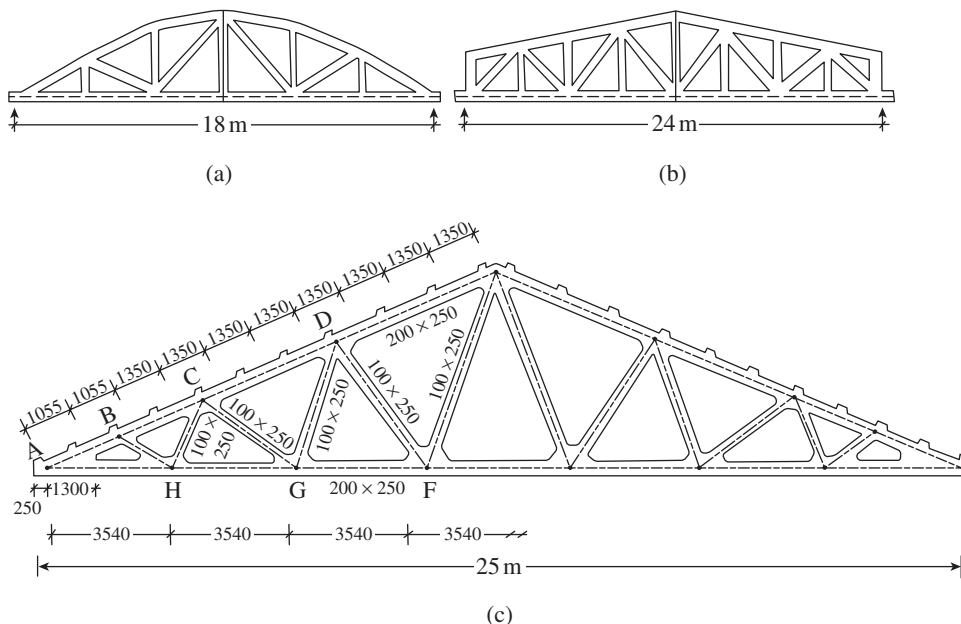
Typical configuration of precast RC trusses with prestressed tie member (a) Bowstring configuration (b) Trapezoidal truss (c) Polygonal truss configuration with typical member sizes
